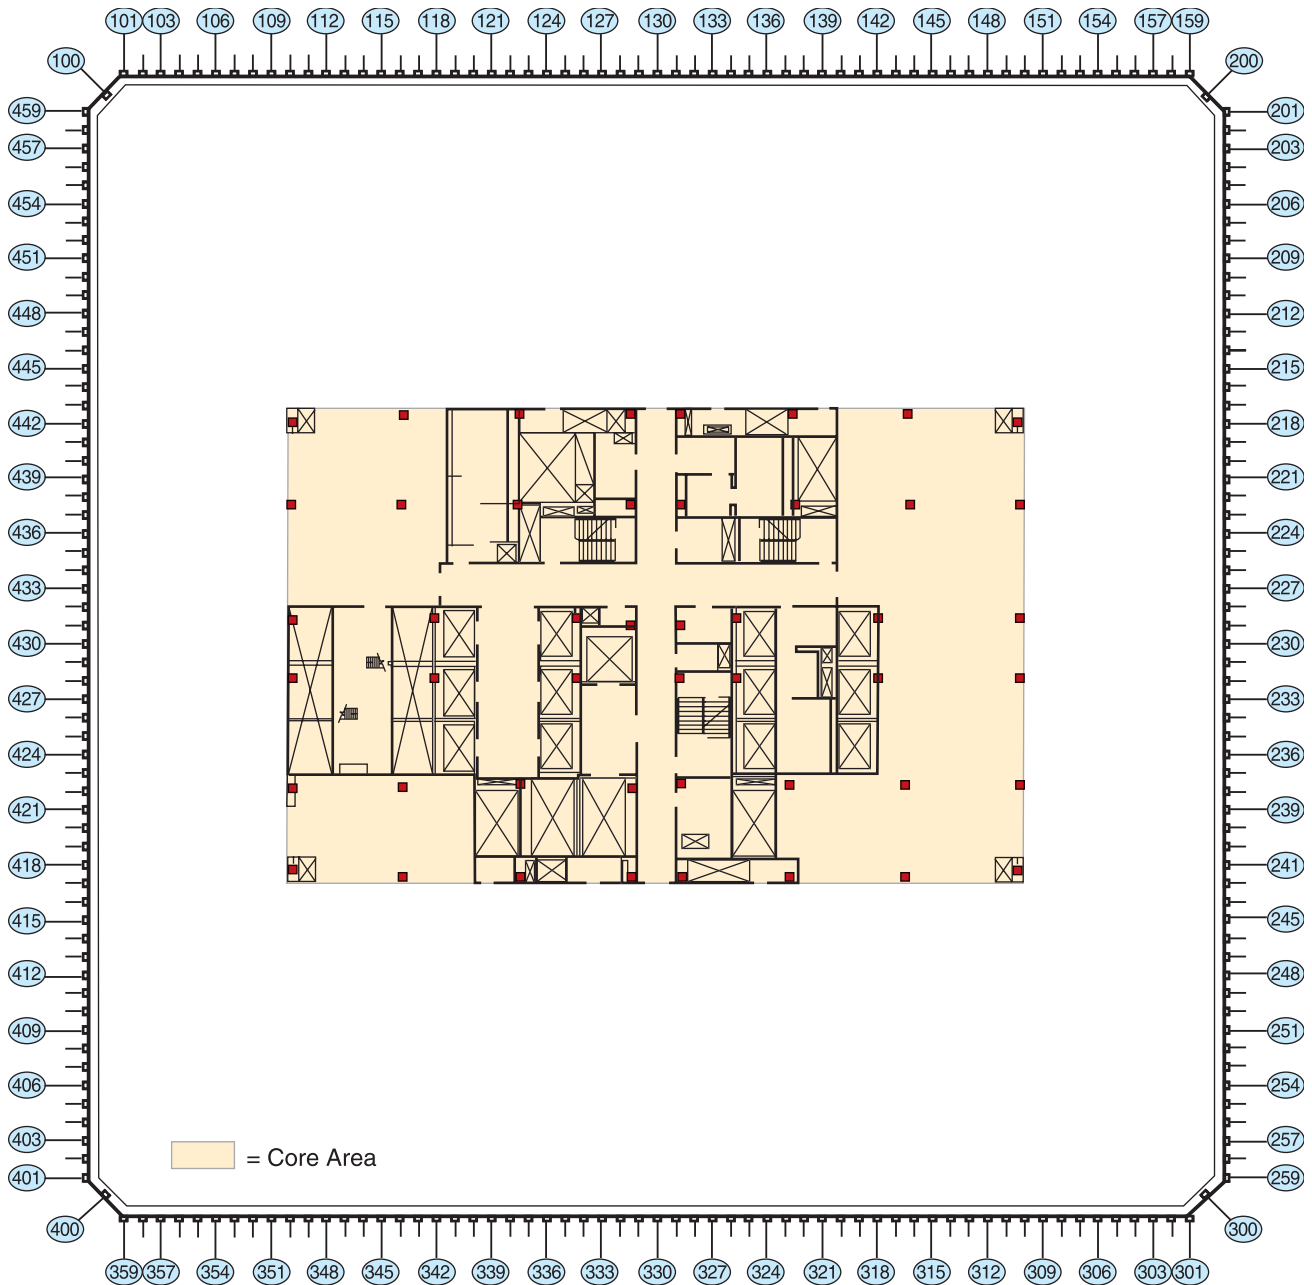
Representative floor plan (based on floor plan for 94th and 95th floors of WTC 1).
